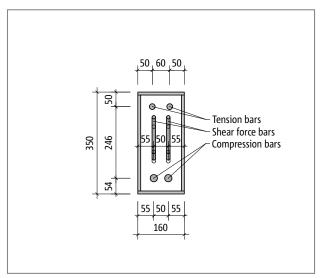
Schöck Isokorb® T type B-M3-V2: Product layout
